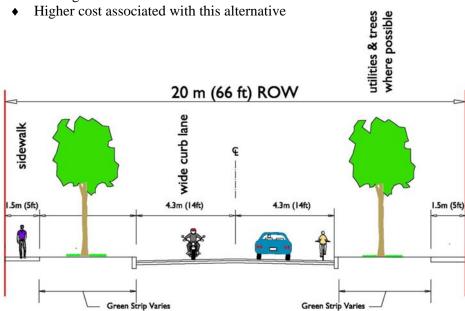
Proposed Southern Cross Section - No Parking Alternative with Wide Curb Lanes.
